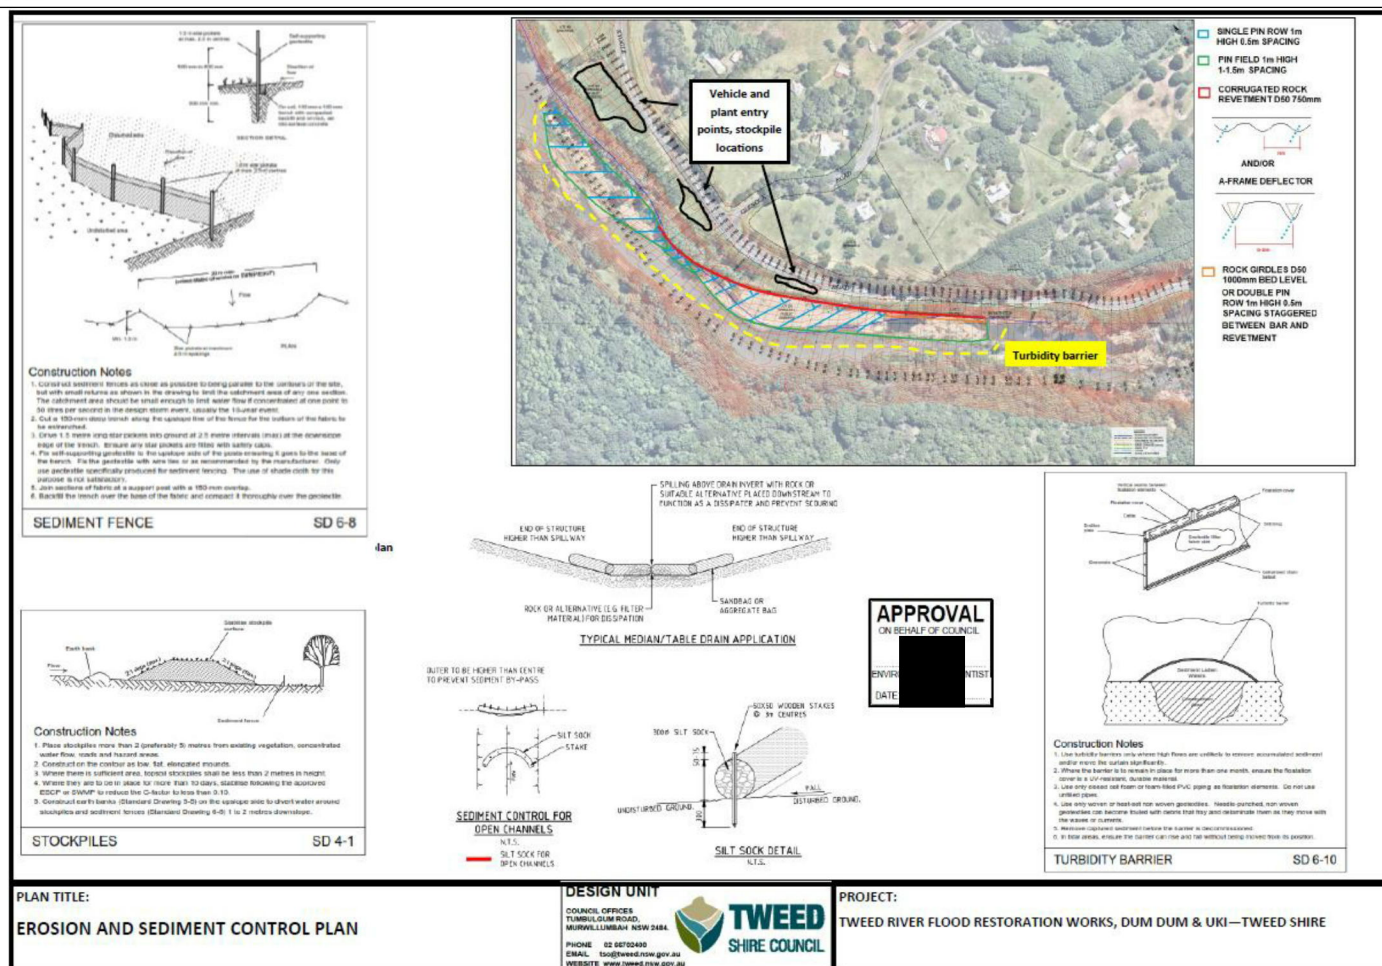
Site layout plan for proposed river bed and bank stabilisation works including minimum sediment and erosion control actions as described within the *Permit Activity* section above.
